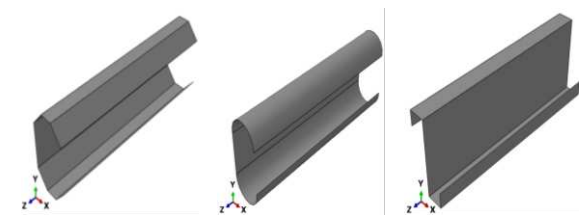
3D drawing of (a) Folded Section (b) C-Section (c) Z-Section
